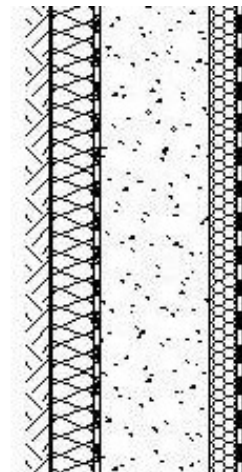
Inside wall towards heated & unheated rooms (source: ISO-PLUS-SYSTEM, 2010)
